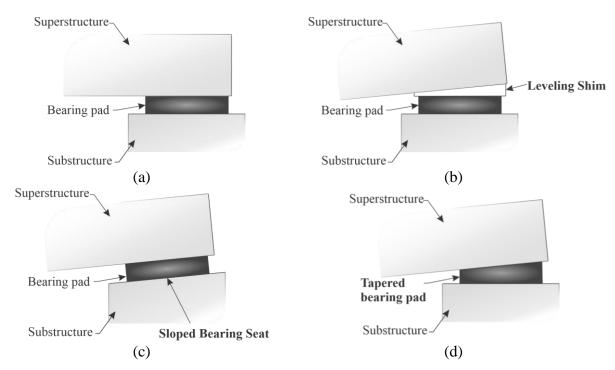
Bearing pad and bridge structure configurations using: (a) Flat bearing pad; (b) Leveling shim and flat bearing pad; (c) Bearing pad and sloped seat; (d) Tapered bearing pad
